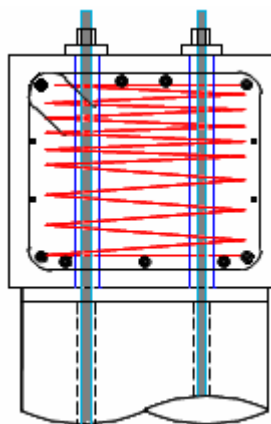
Pierce Elevated Project Precast Bent Caps
